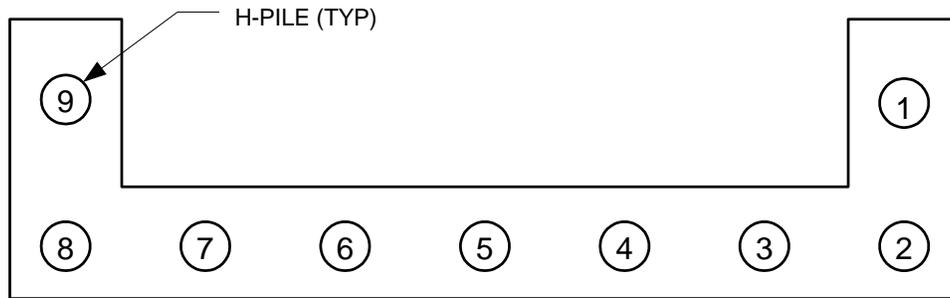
Track 3 Example 1: Pile arrangement at an abutment
